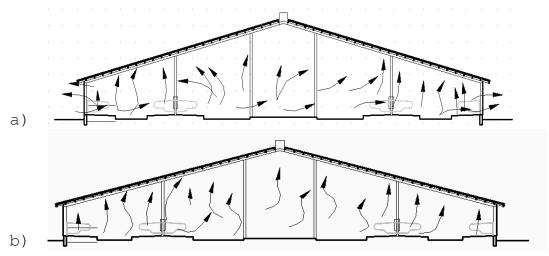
Air moving schemes: a) insulated roof; b) metal sheet roof.
